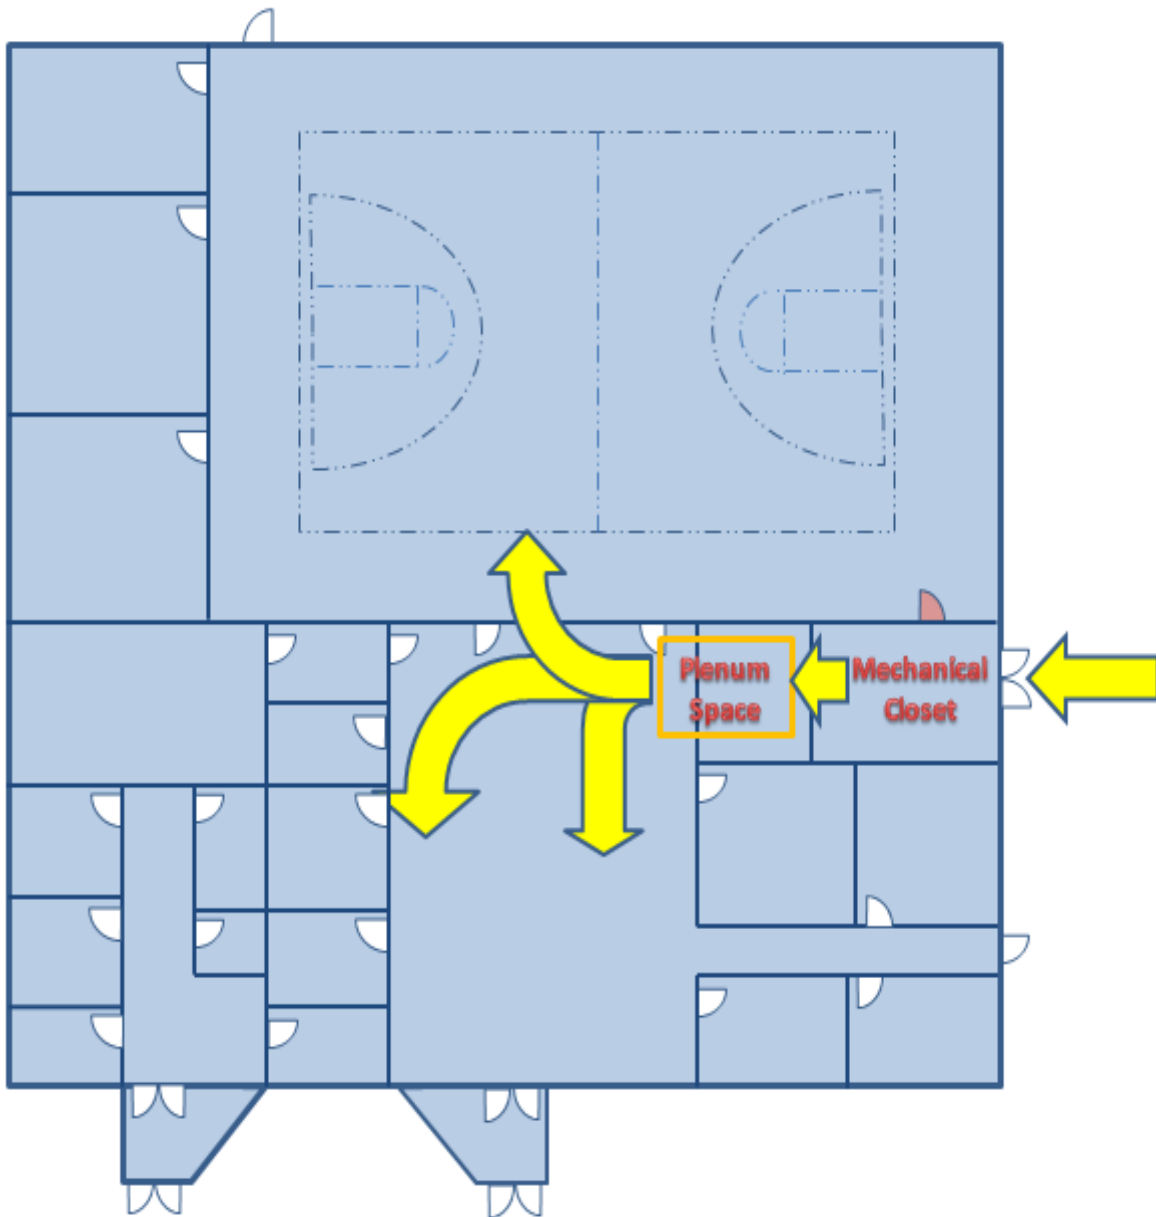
Floorplan shows how poor air sealing and combustion details allow infiltration throughout entire building causing poor humidity and serious condensation problems (YAC4). [Barcik photo]
